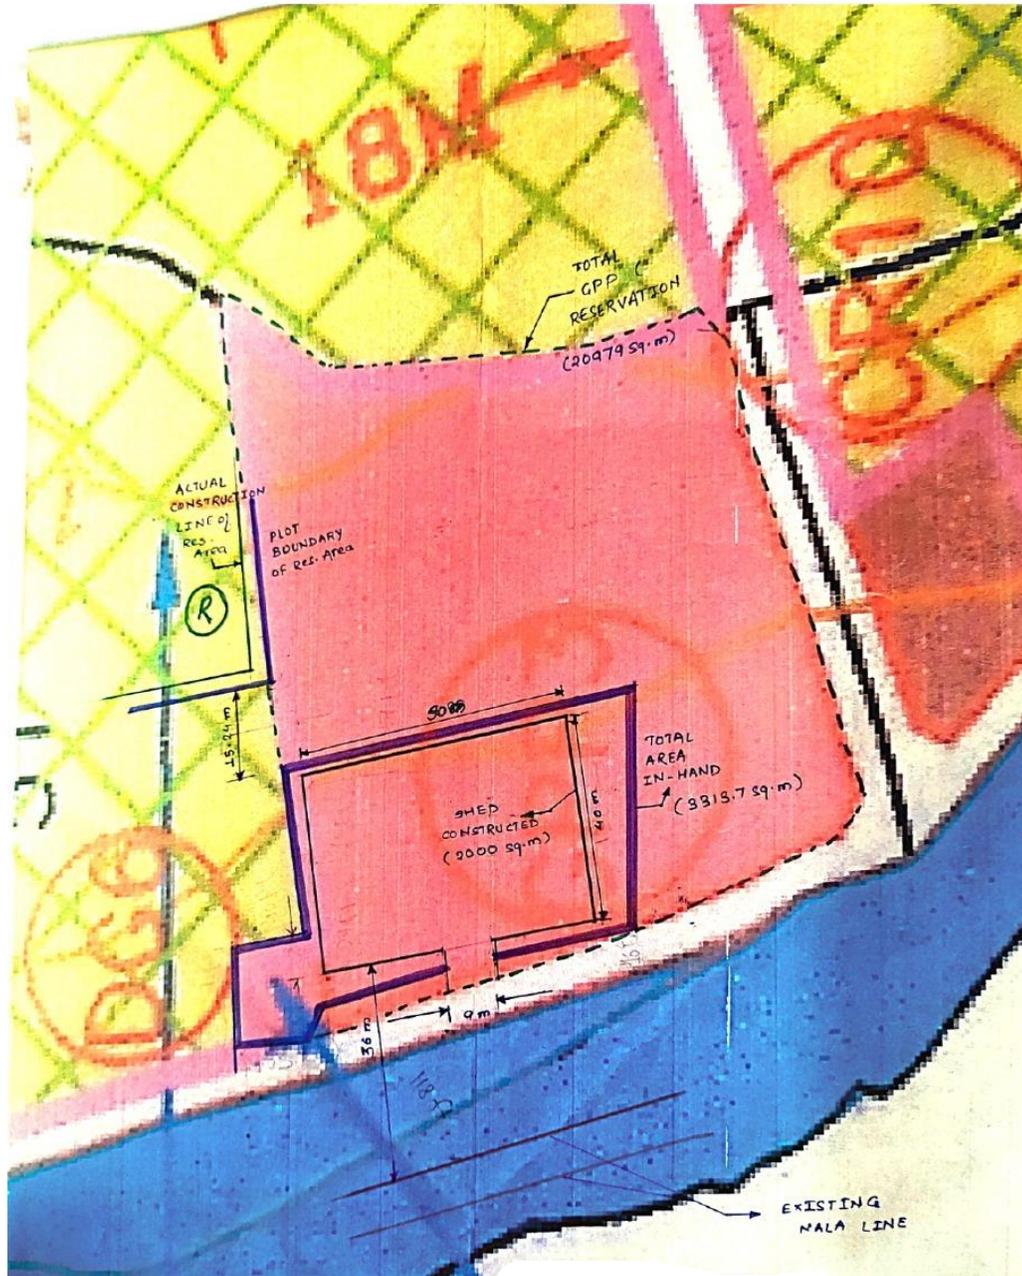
Layout plan/map-Garbage Processing Plant, Ambegaon BK, Pune
